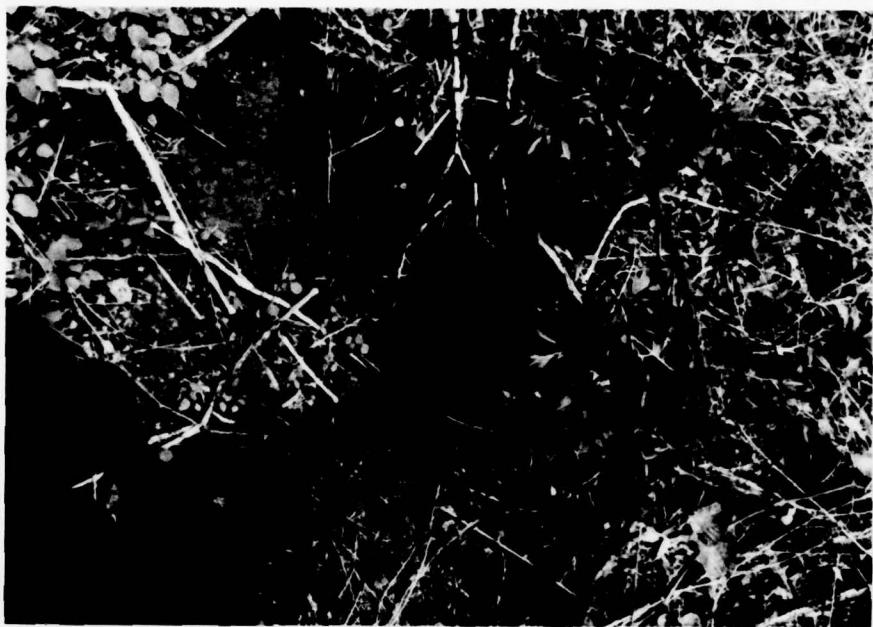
Detail showing a typical animal burrow in the downstream face.
